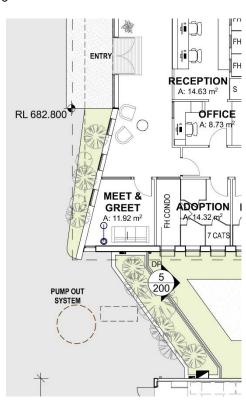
B: DA approved planting bed at the front of Animal Shelter building (source: F&J Tepa)
